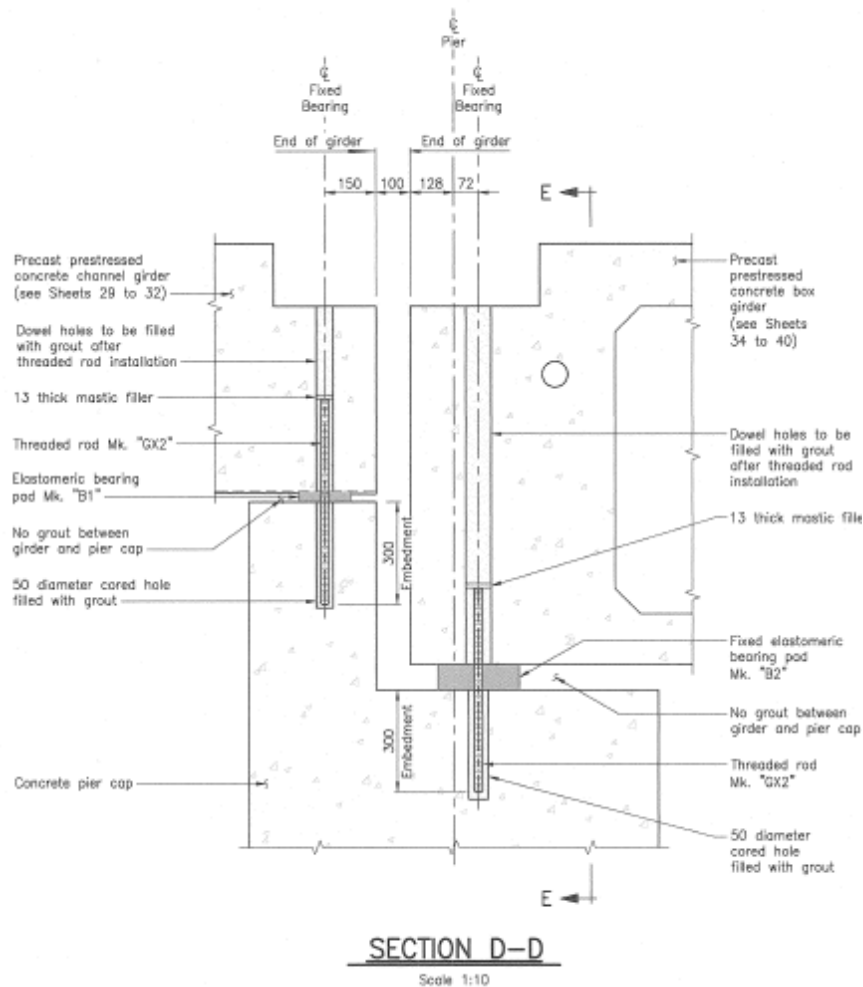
Fixed End of Girder Dowel Fixity Connection (WSP 2018)
